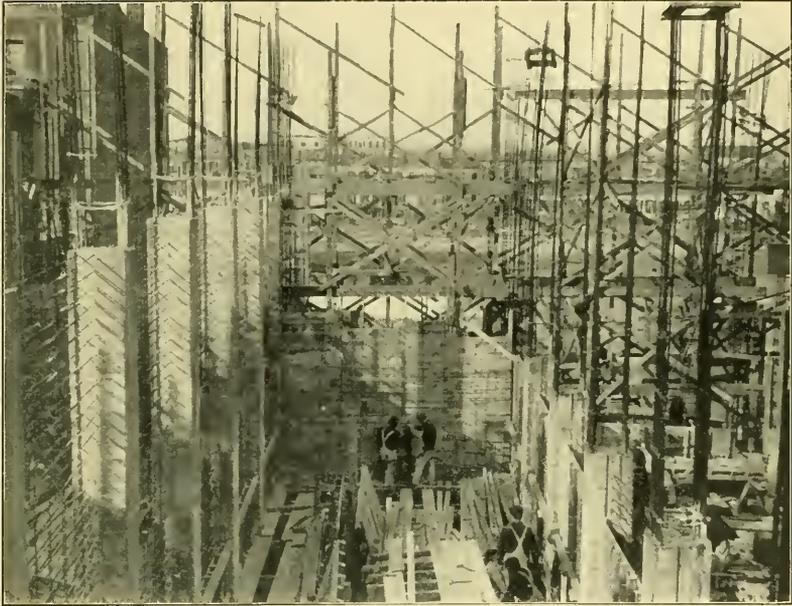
REINFORCED CONCRETE STRUCTURE FOR ICE STORAGE.
